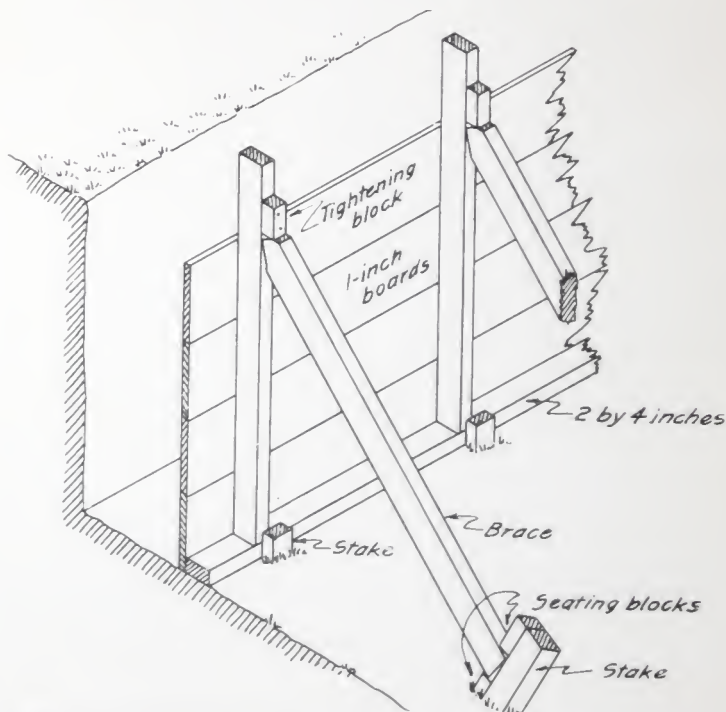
Type of form used for constructing basement wall when the earth is firm enough to make an outside form unnecessary.
